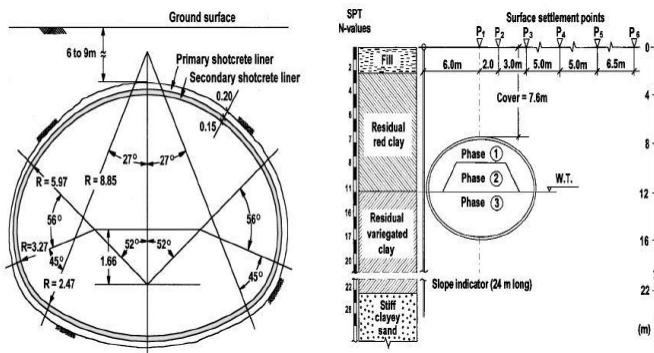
Tunnel cross section (Lengths in meters), Geotechnical profile, Tunnel construction phases and instrumentation [18]
